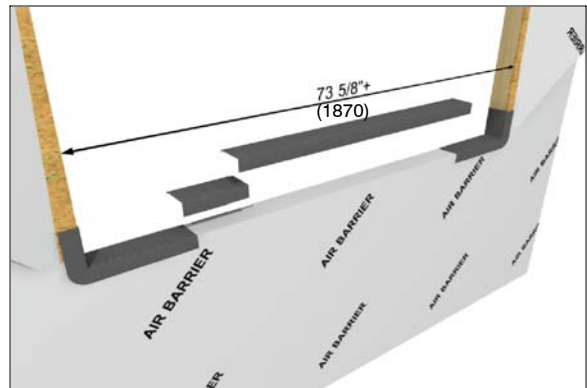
Rough openings greater than 73 5/8" (1870): Rough openings wider than 73 5/8" (1870) require more than one center section. See figure 26.
